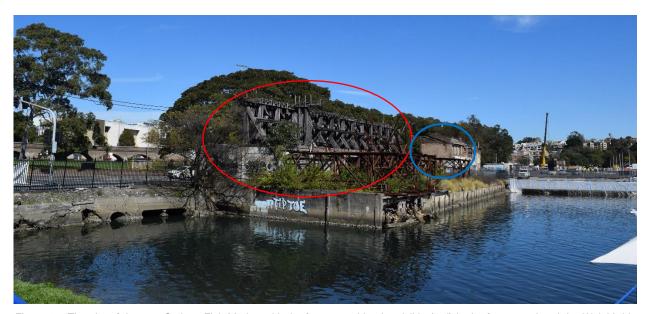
The site of the new Sydney Fish Market with the former coal loader visible (red) in the foreground and the Weighbridge Building in the background (blue) prior to the removal of salvaged elements. Stormwater outlets and seawall are seen to the east (left) of the coal loader.
